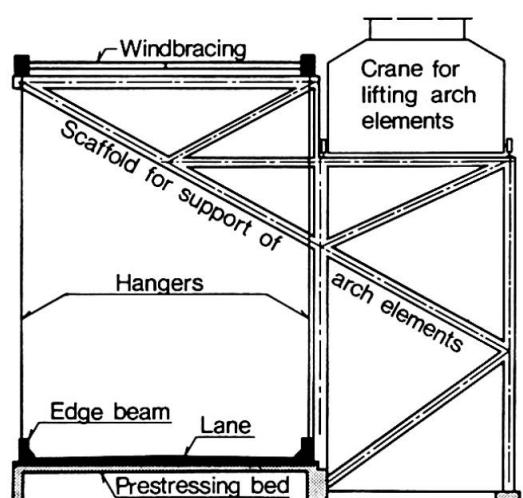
Cross-sections of rig for casting of the lane, edge beam and joints in arches.
